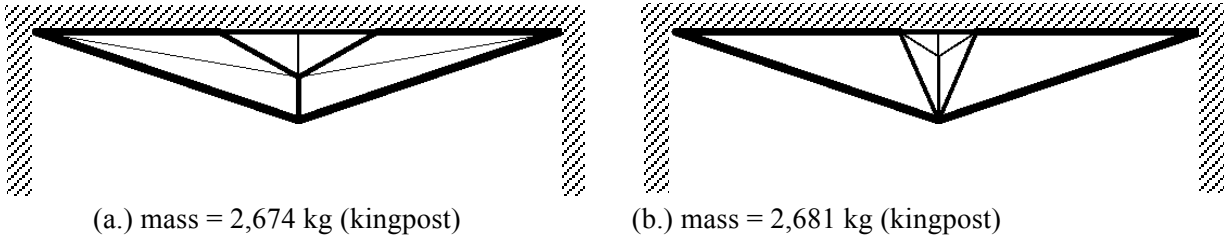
Symmetric roof truss layout for depth = 1/6 span with gauge sizing
